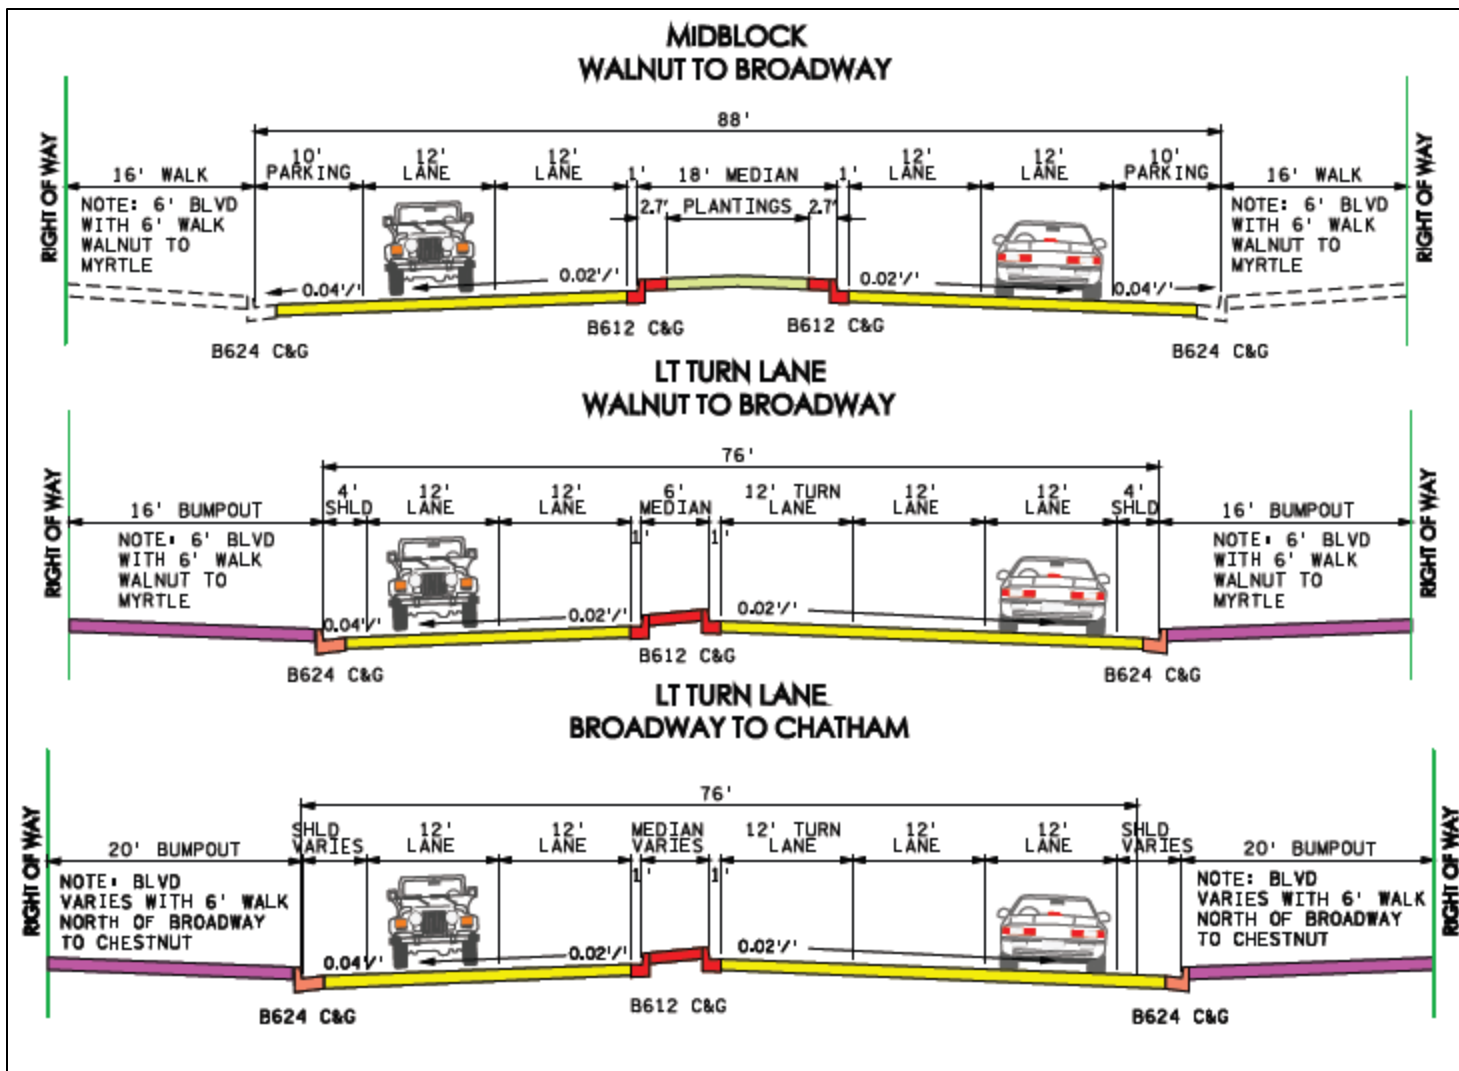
TH 169 Cross-Sections from Walnut to Chatham After Reconstruction
